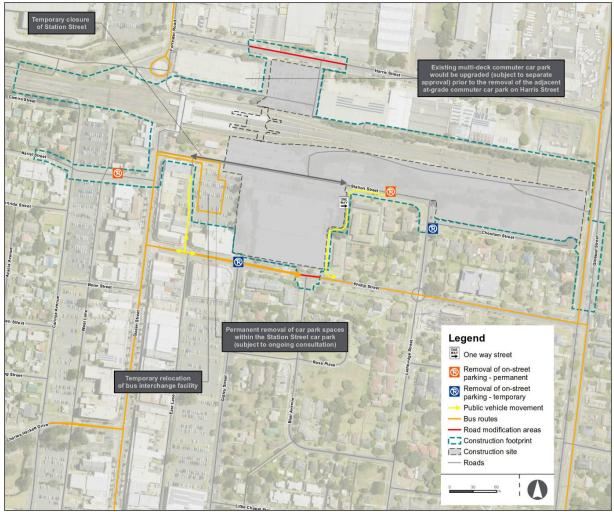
| Temporary construction on-street parking and road access changes at St Marys (Source: Submissions Report)
